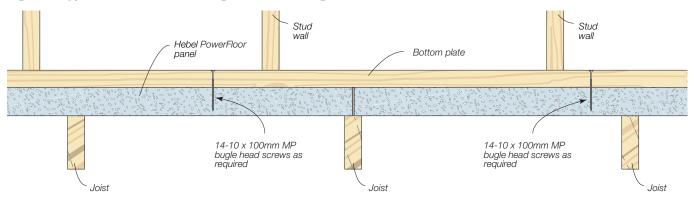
Joists Blocking Detail Under Loadbearing Walls Running Perpendicular to Joists
